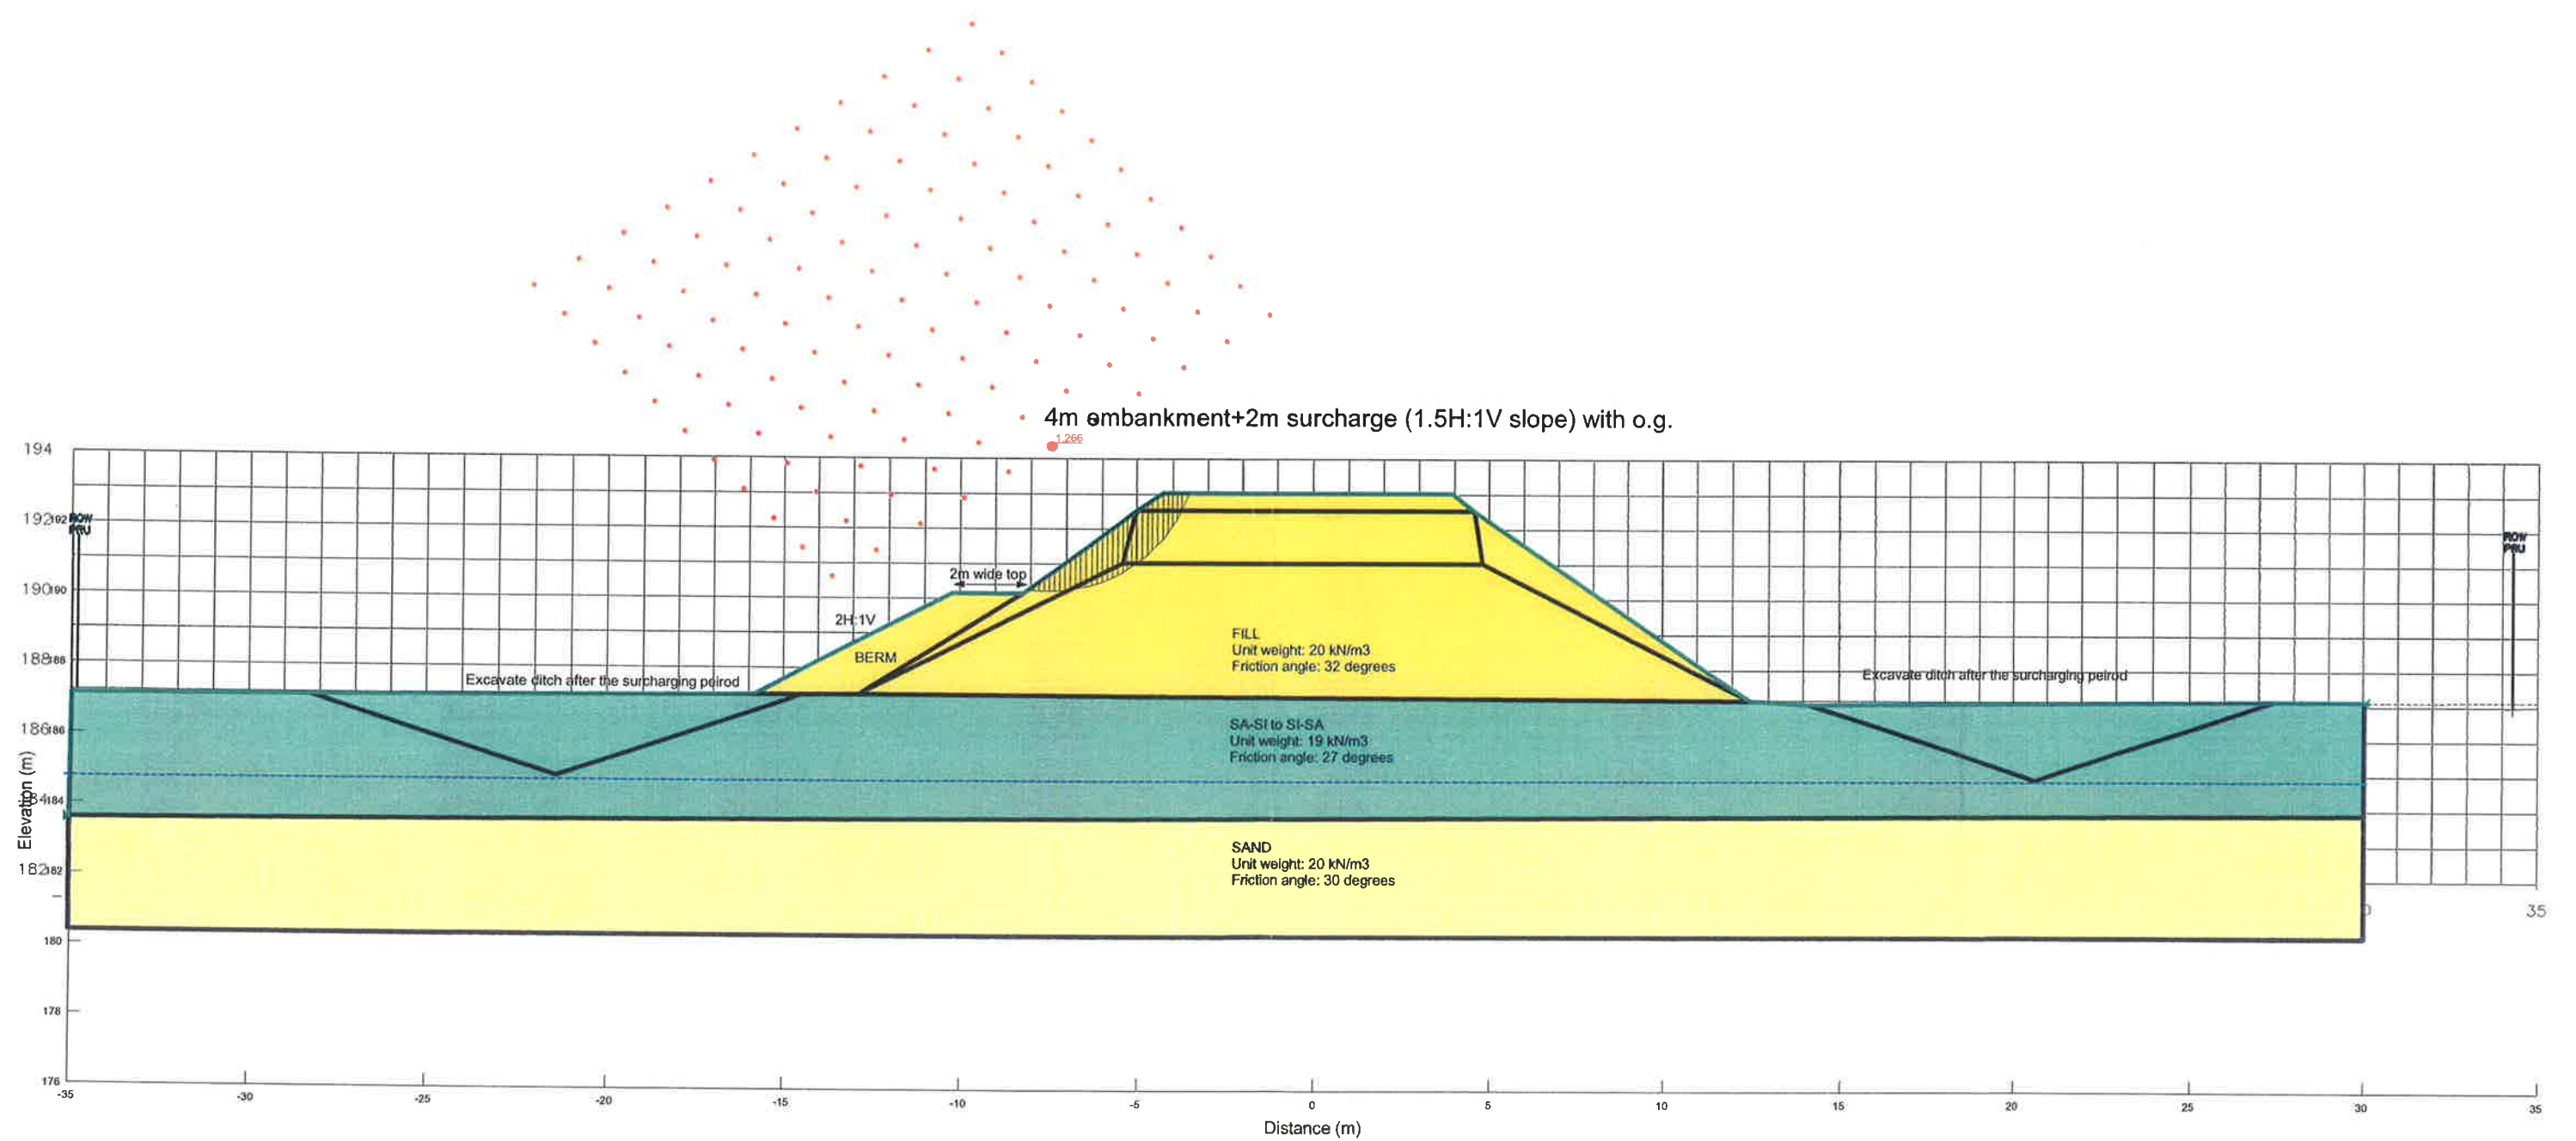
1.5H:1V slope (2 m surcharge with berm)
